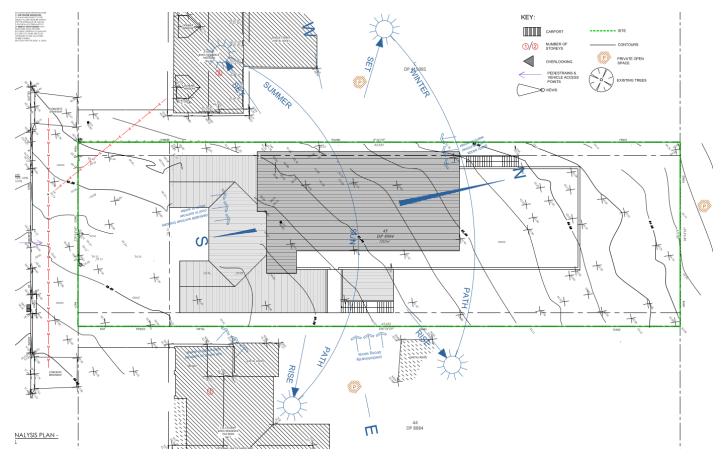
Site Plan. Source: Architectural plans prepared by Janssen Designs.
